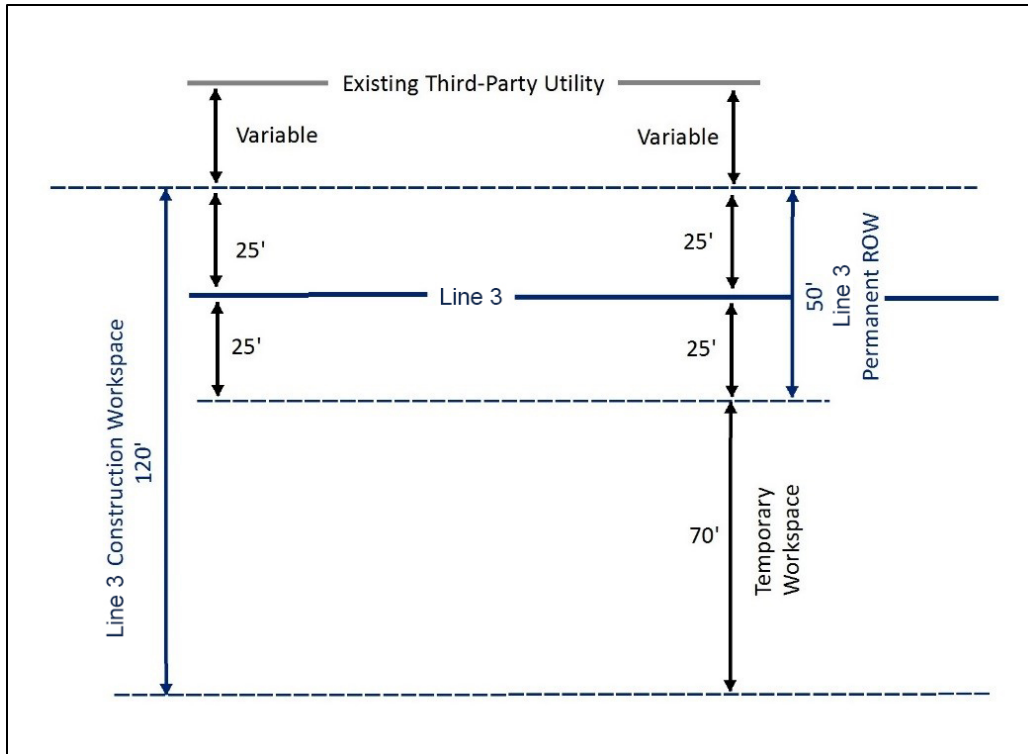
Plan View – Proposed Co-Location of the Proposed Line 3 Pipeline Right-of-Way with Existing Pipelines, Transmission Lines, and Highways in Uplands
